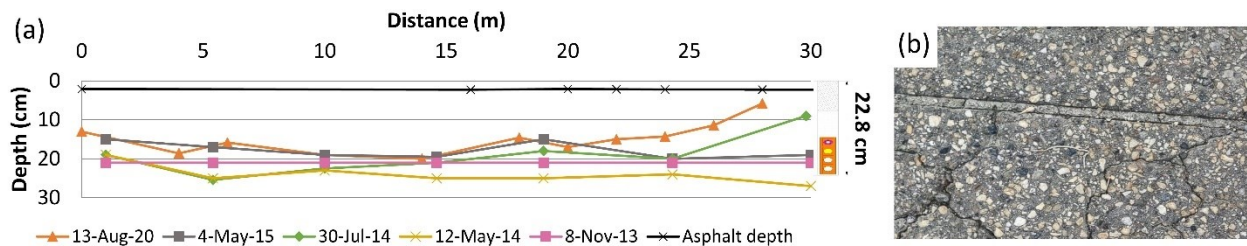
(a) Conduit displacement within trench based on GPR monitoring of the 30m VIF installation with traffic load, and (b) alligator cracking near path of VIF MT installation (seven years after installation)
